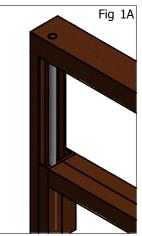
A: If window is already installed. Fully lower the sash before attempting to insert the balance into the machined groove in the sash or frame.
